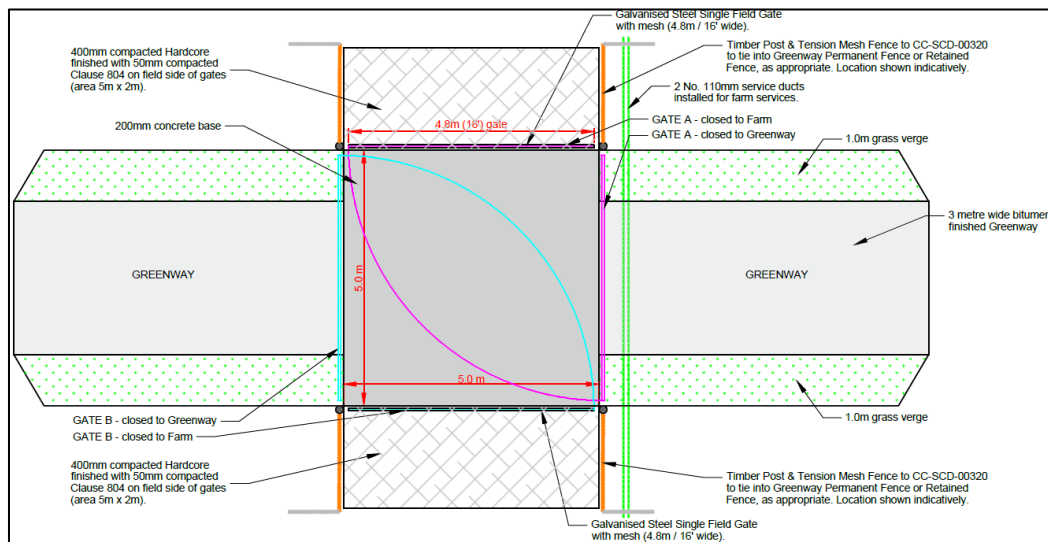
Standard Agricultural At Grade Crossing Plan Layout
